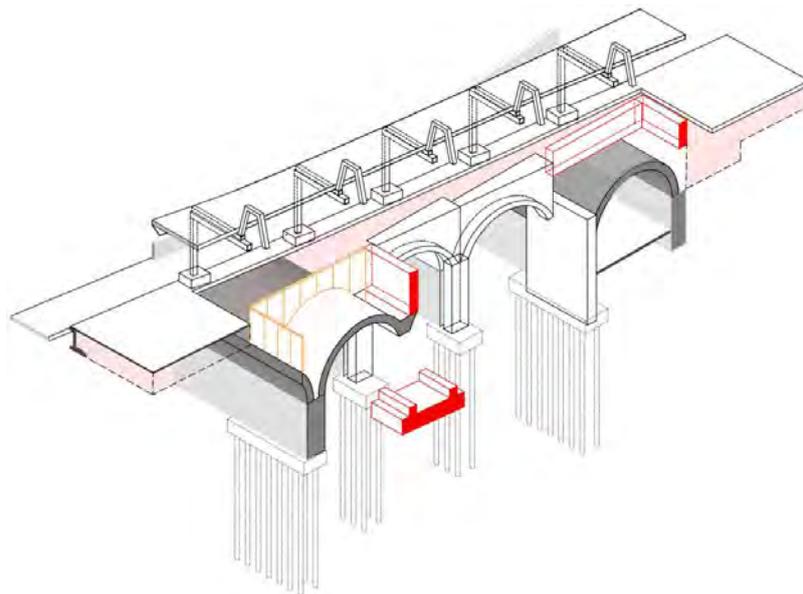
3D view of step 8 – escalator pit foundation construction
